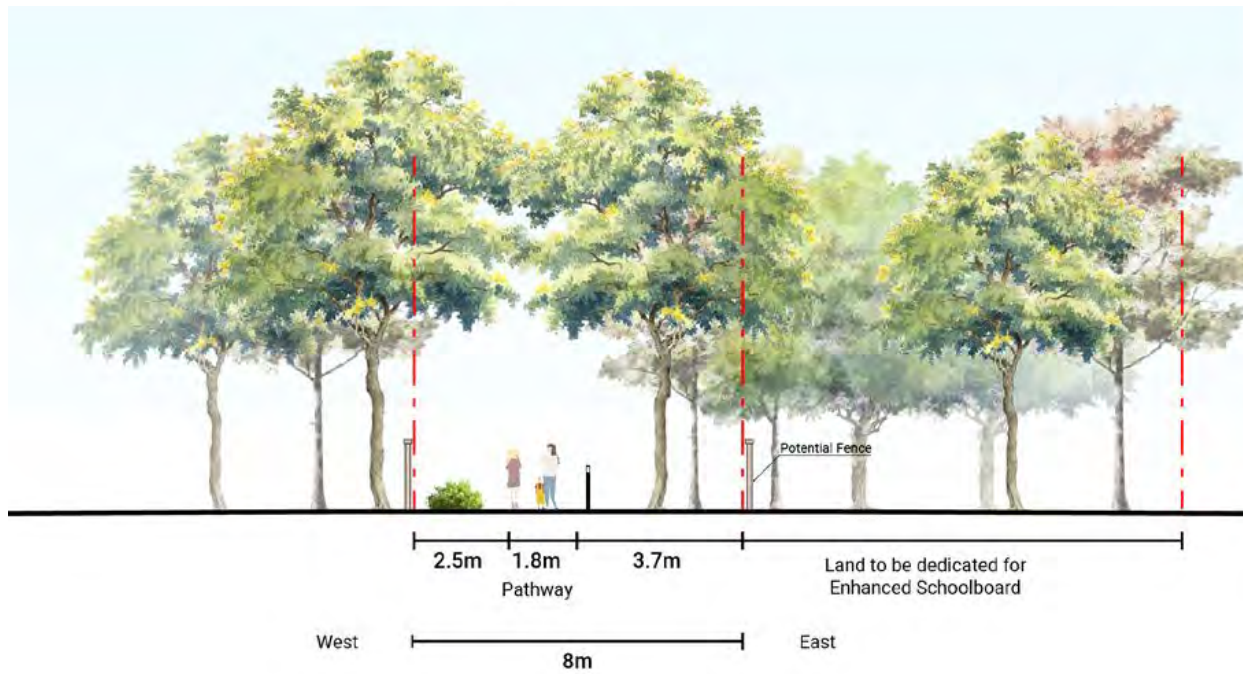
Alice Street Pathway Cross-Section 2 Looking North
